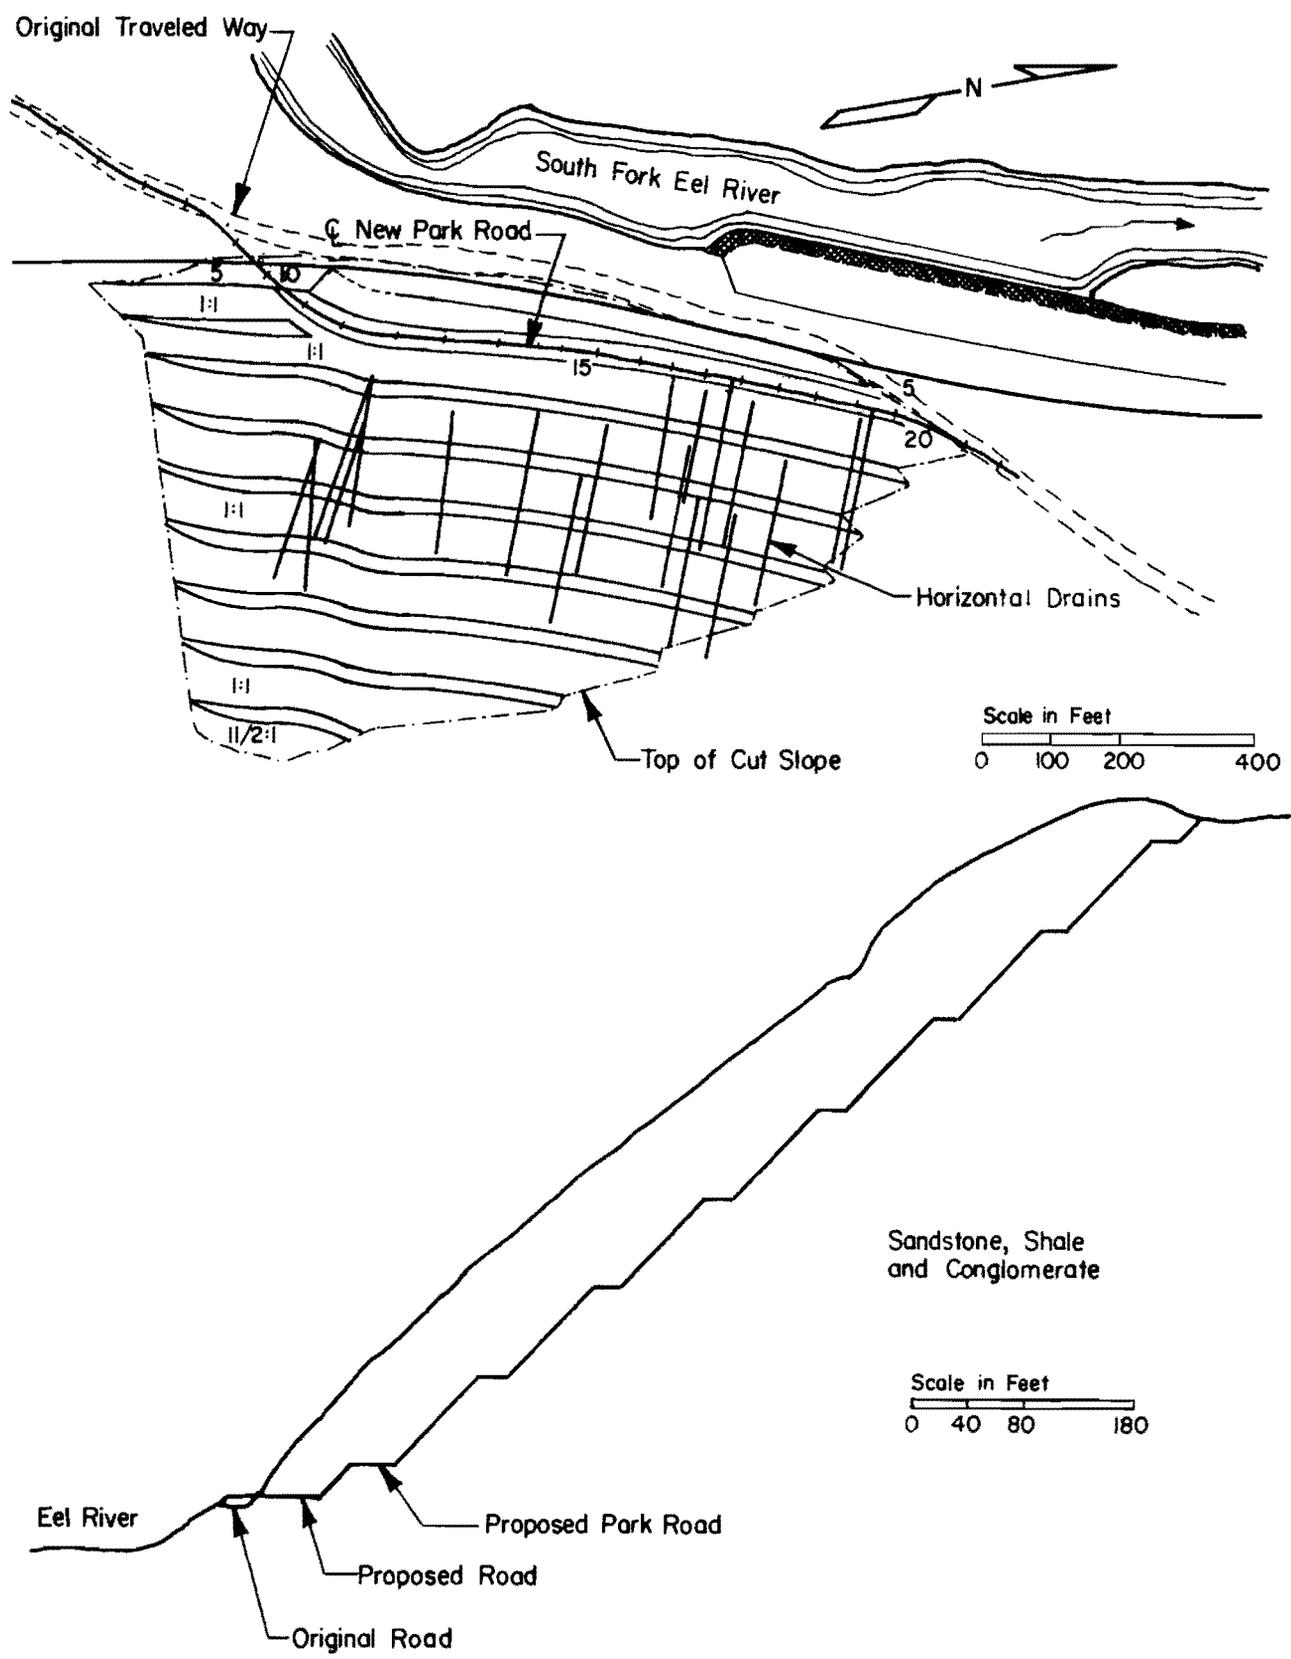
Combined benching and drainage for slope stabilization - Dyerville cut (Cedergren, 1962).
